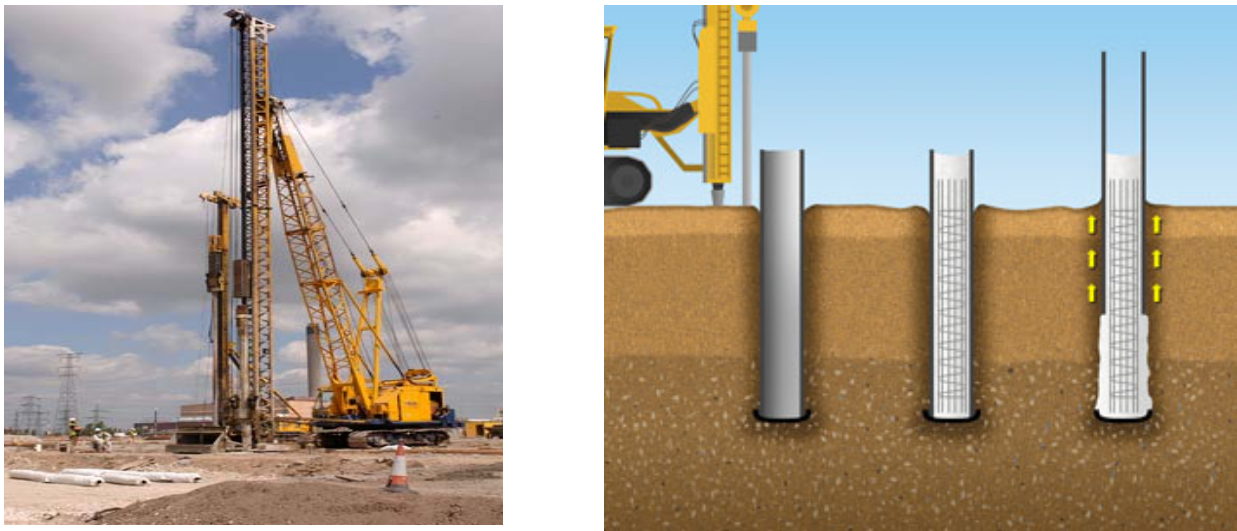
(a) Installation of hollow steel tube and (b) Schematic of driven cast-in-situ pile installation (images courtesy of Keller Foundations, UK)
